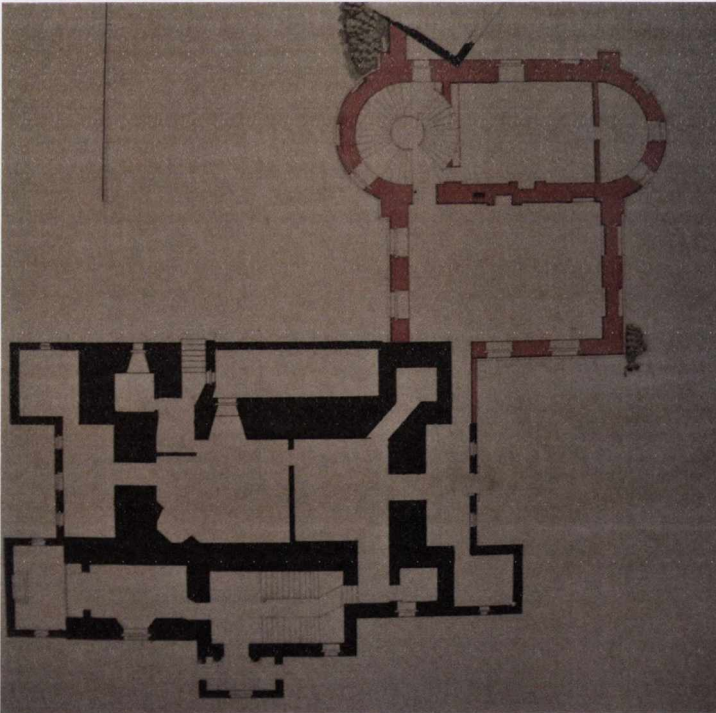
Killeen Castle, proposal, ground floor plan, attrib. to Daniel Augustus Beaufort, [1802], IAA, RIAI Murray Collection, 92/46.898, courtesy of the Irish Architectural Archive.
